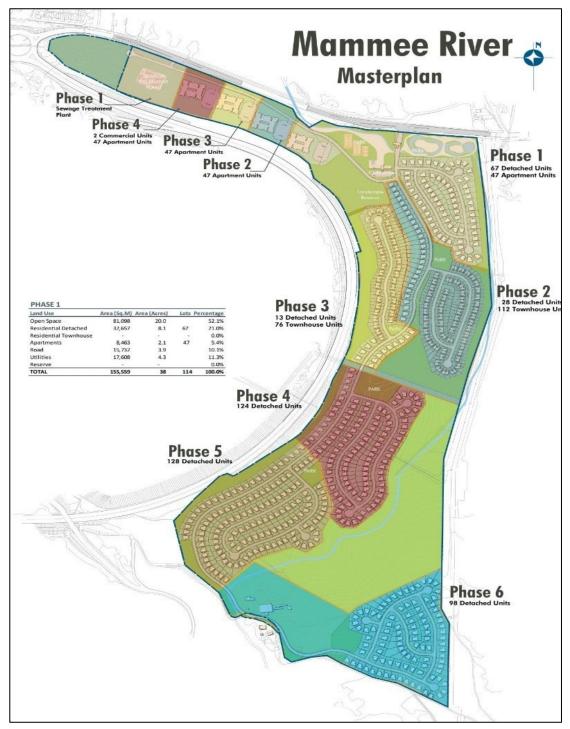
Site Layout plan and phases of development, as May 26, 2023
